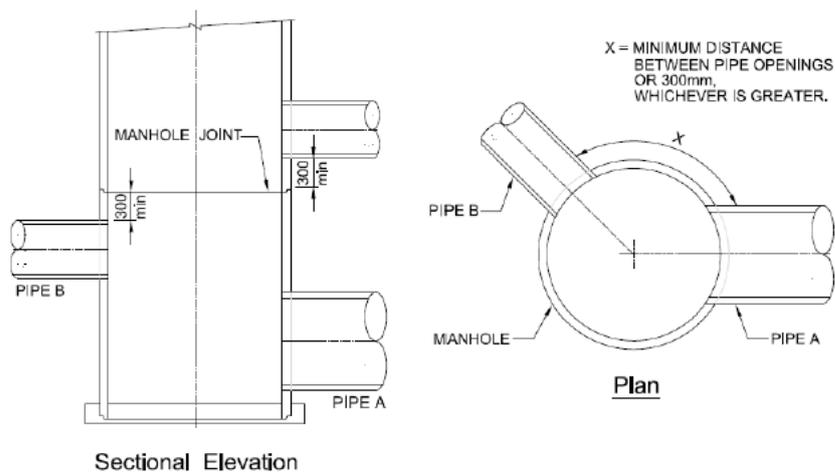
Manhole layout (from CPAA Guidance Note: Loads on Circular Precast Concrete Manholes and Access Chambers: March 2016)
